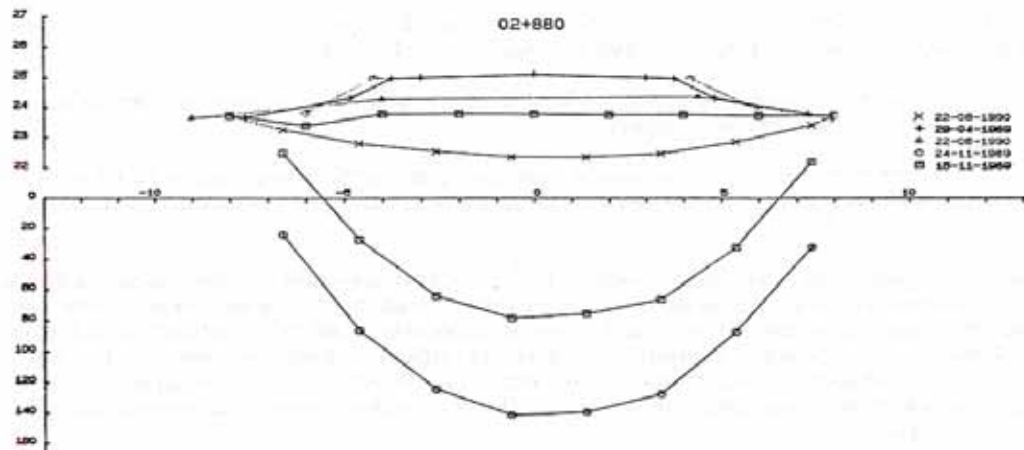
Typical cross-section from a Hydrostatic profile gauge.
